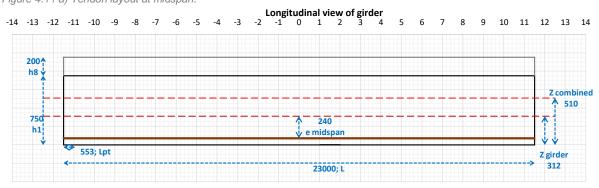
c) Longitudinal view of simplified prestressing layout, all strands are replaced by one equivalent tendon. Schematisation of prestressing force
